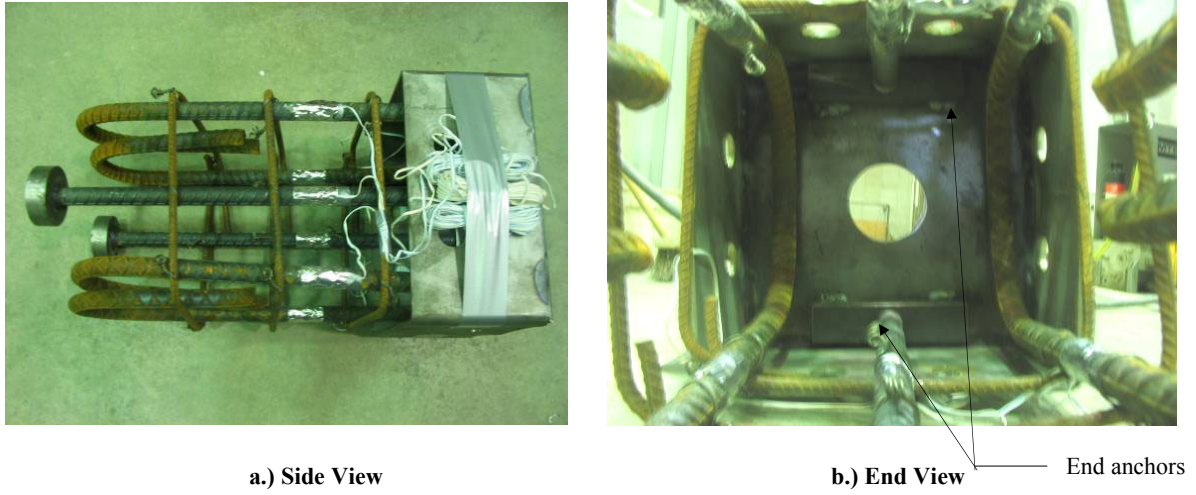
Column 6 mild steel reinforcement in the 2 ft. segment.
